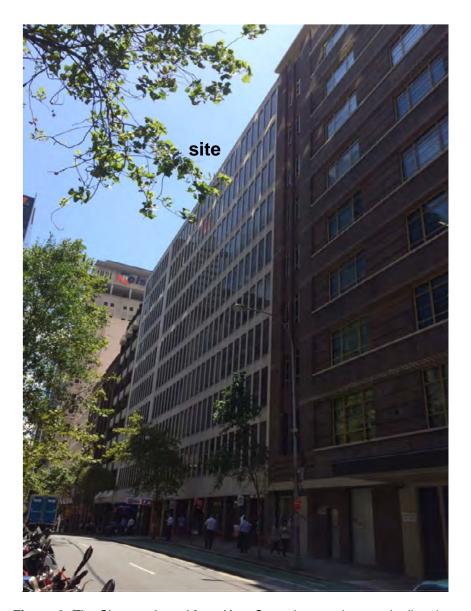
The Site, as viewed from Kent Street in a north easterly direction.
